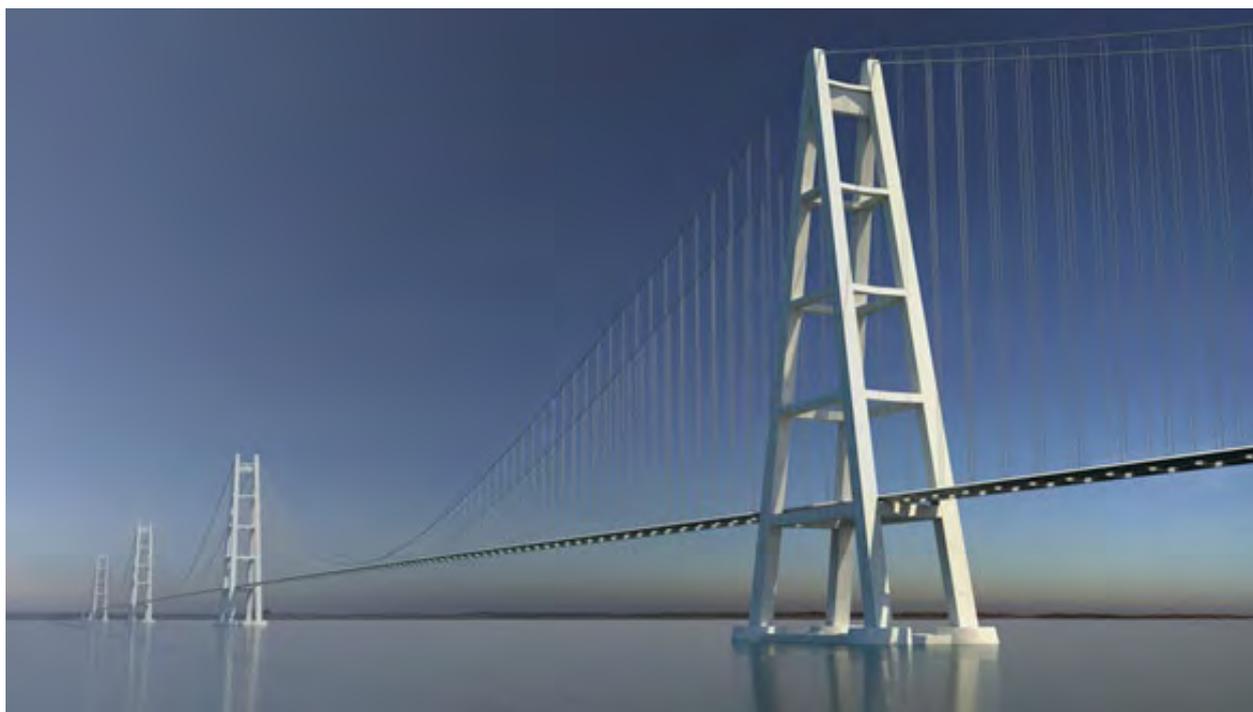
The Yemen-Djibouti Bridge (proposed) is a model for the type of bridge crossing envisaged here. © COWI 2021.
